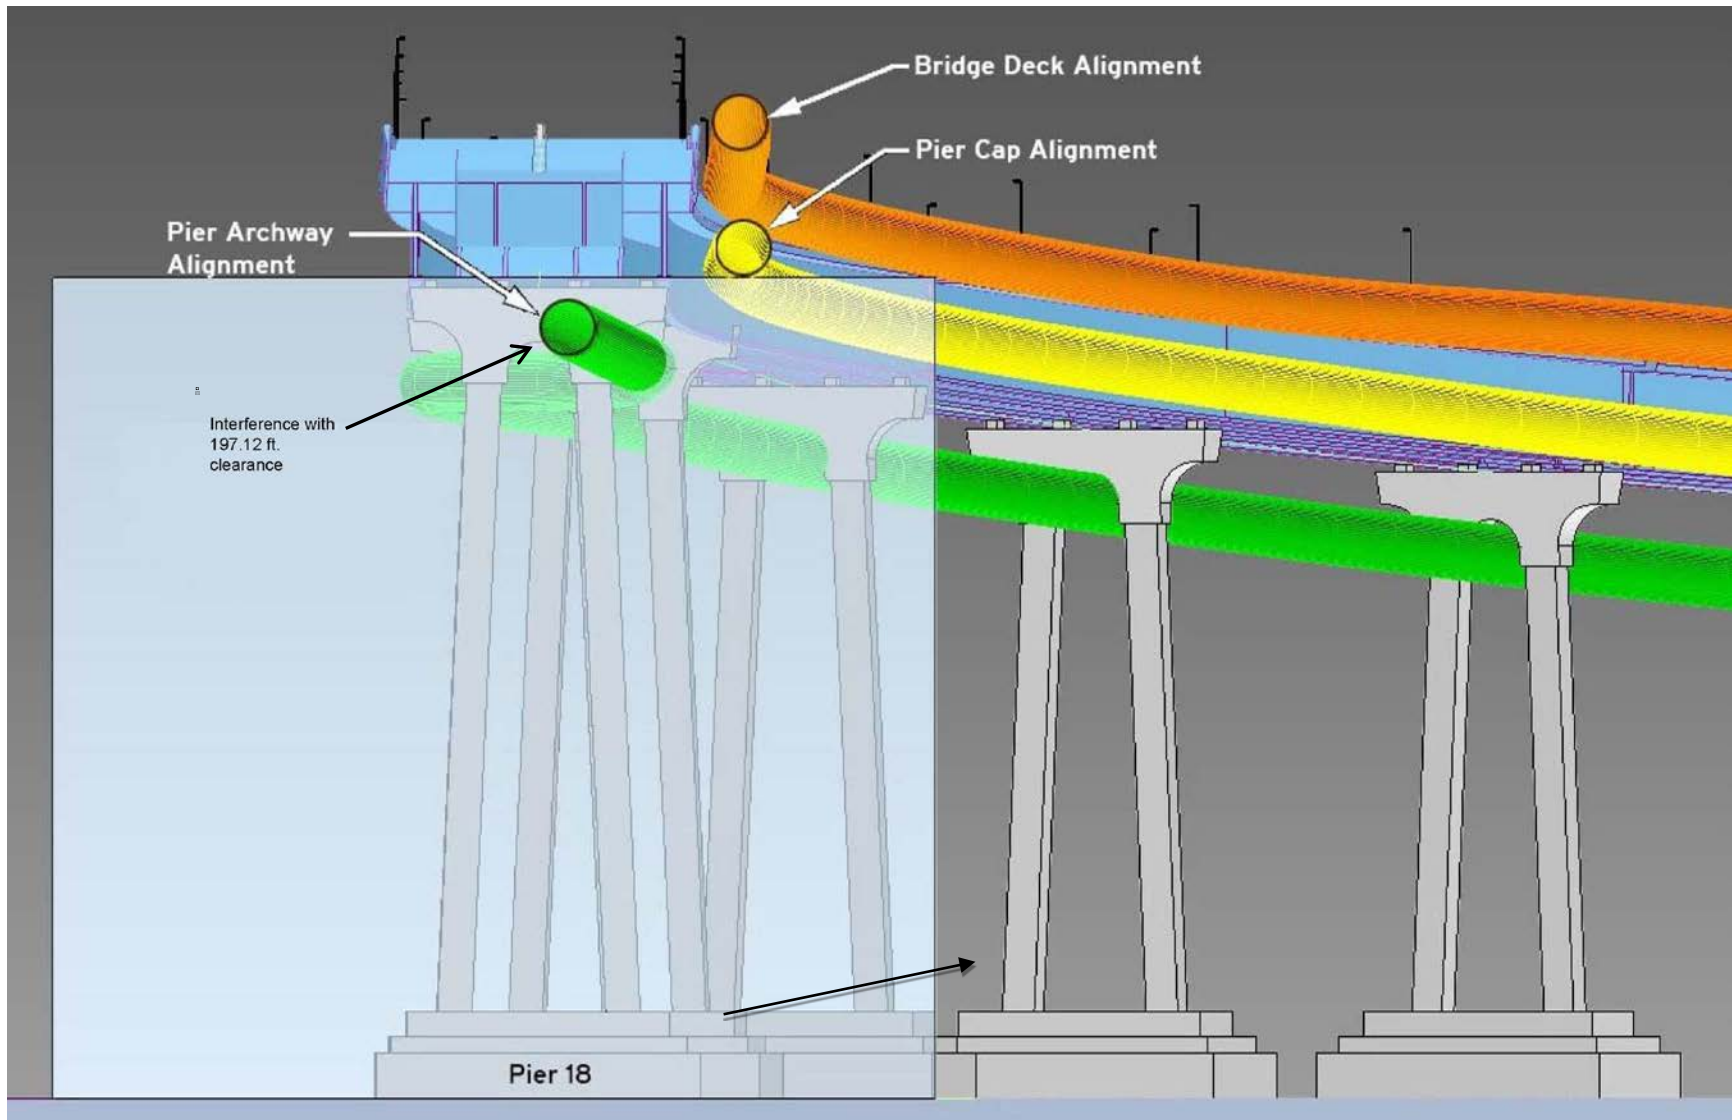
Position of Pier Archway, Pier Cap and Bridge Deck Alignments Relative to Navigational Channel at Pier 18
